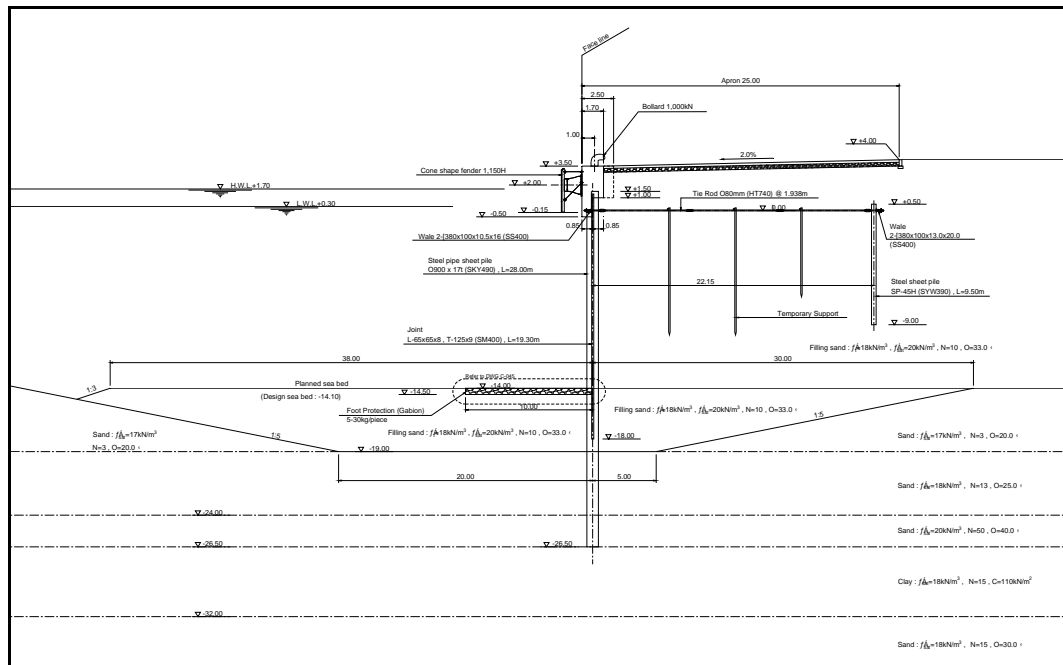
Typical Section of -14m NWQ (L=300m)
